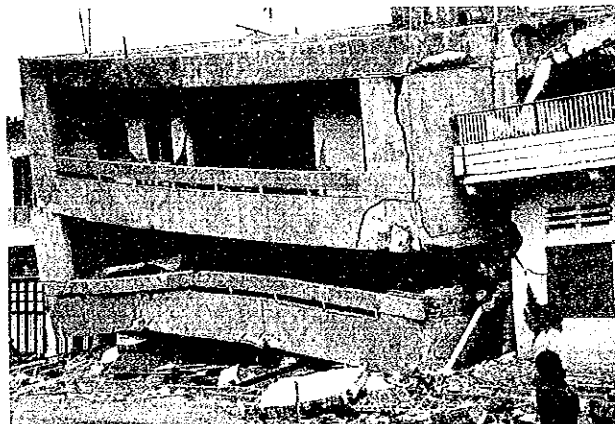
Collapse of Reinforced Concrete Building Which Seemed to be Heavier
